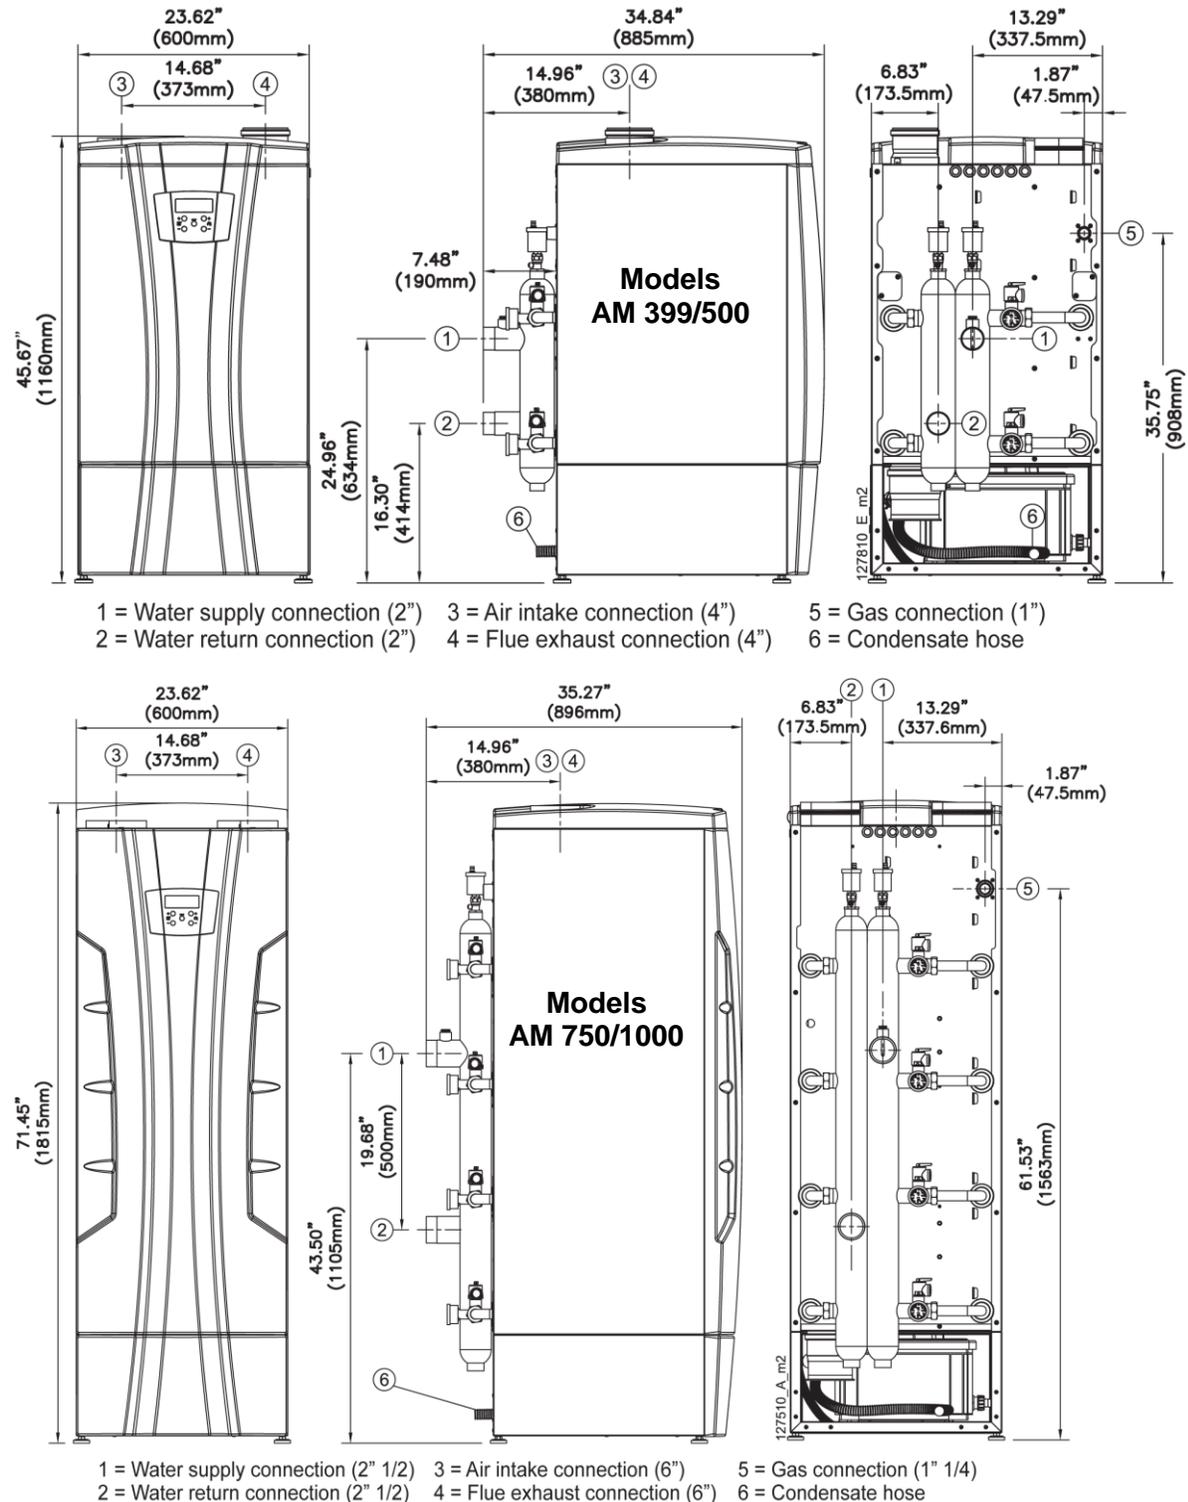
AM 399/500 & 750/1000 Installation Connection Dimensions
